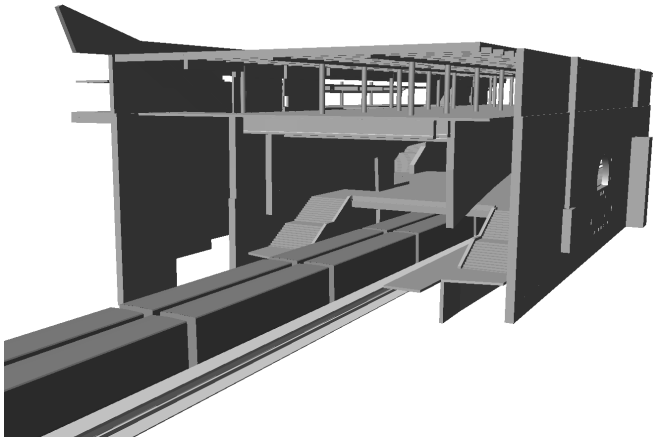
Subway Station, finishing construction works become “hidden” by the walls and slabs
